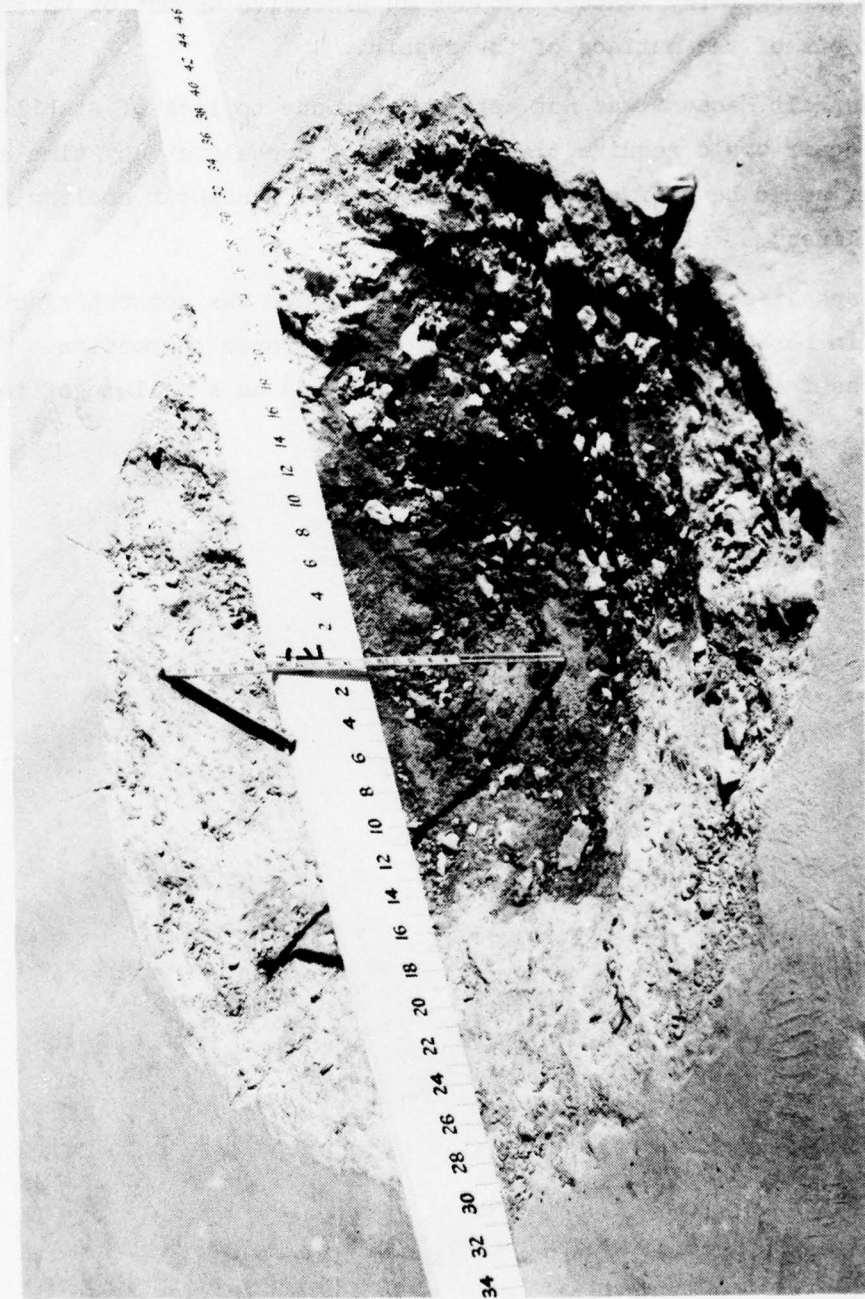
Typical 5-Foot-Diameter Area in Portland Cement Concrete Pavement
